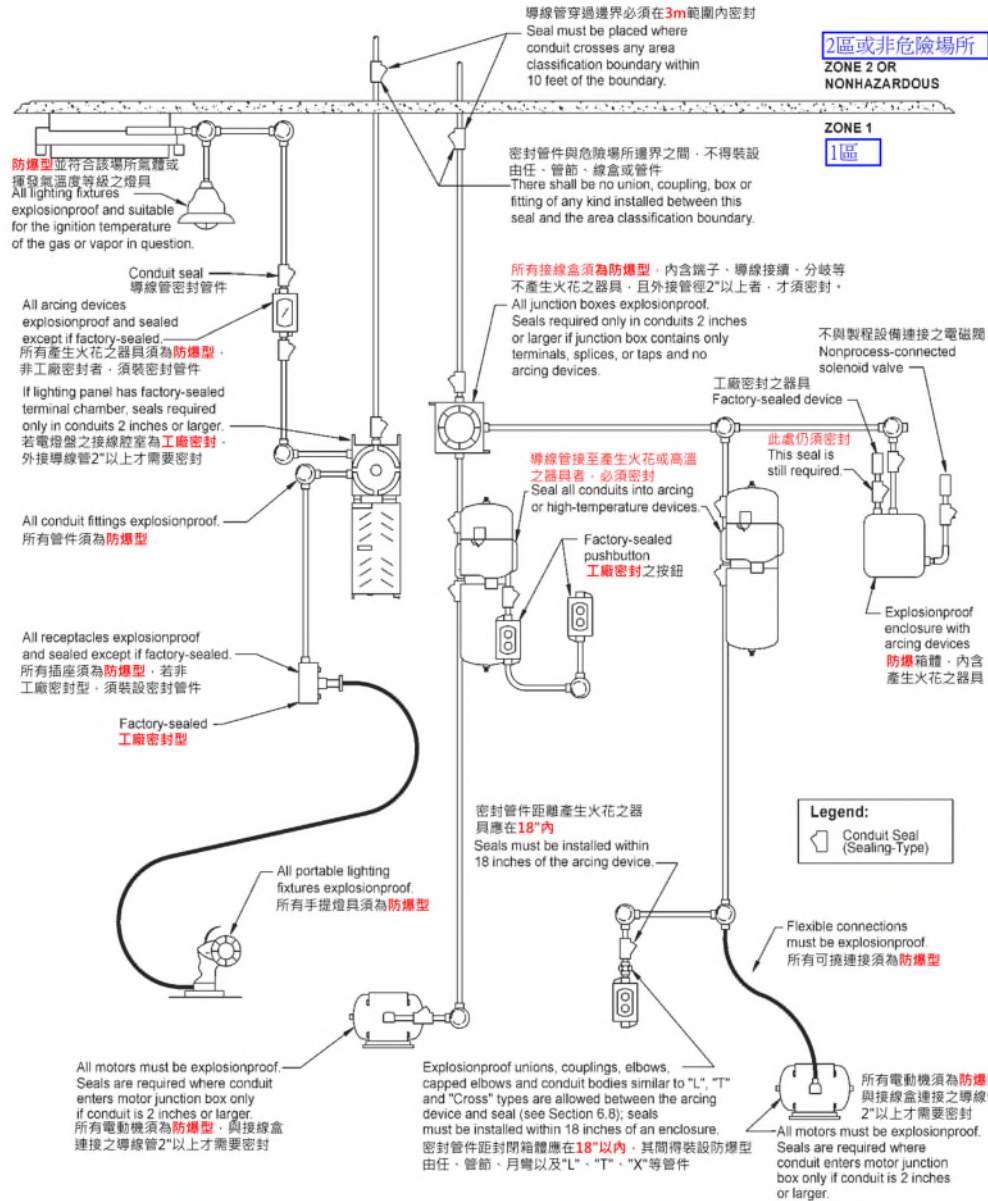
Typical Class I, Zone 1 Electrical Installation Conduit System Utilizing Class I, Division I Equipment and Wiring Methods
